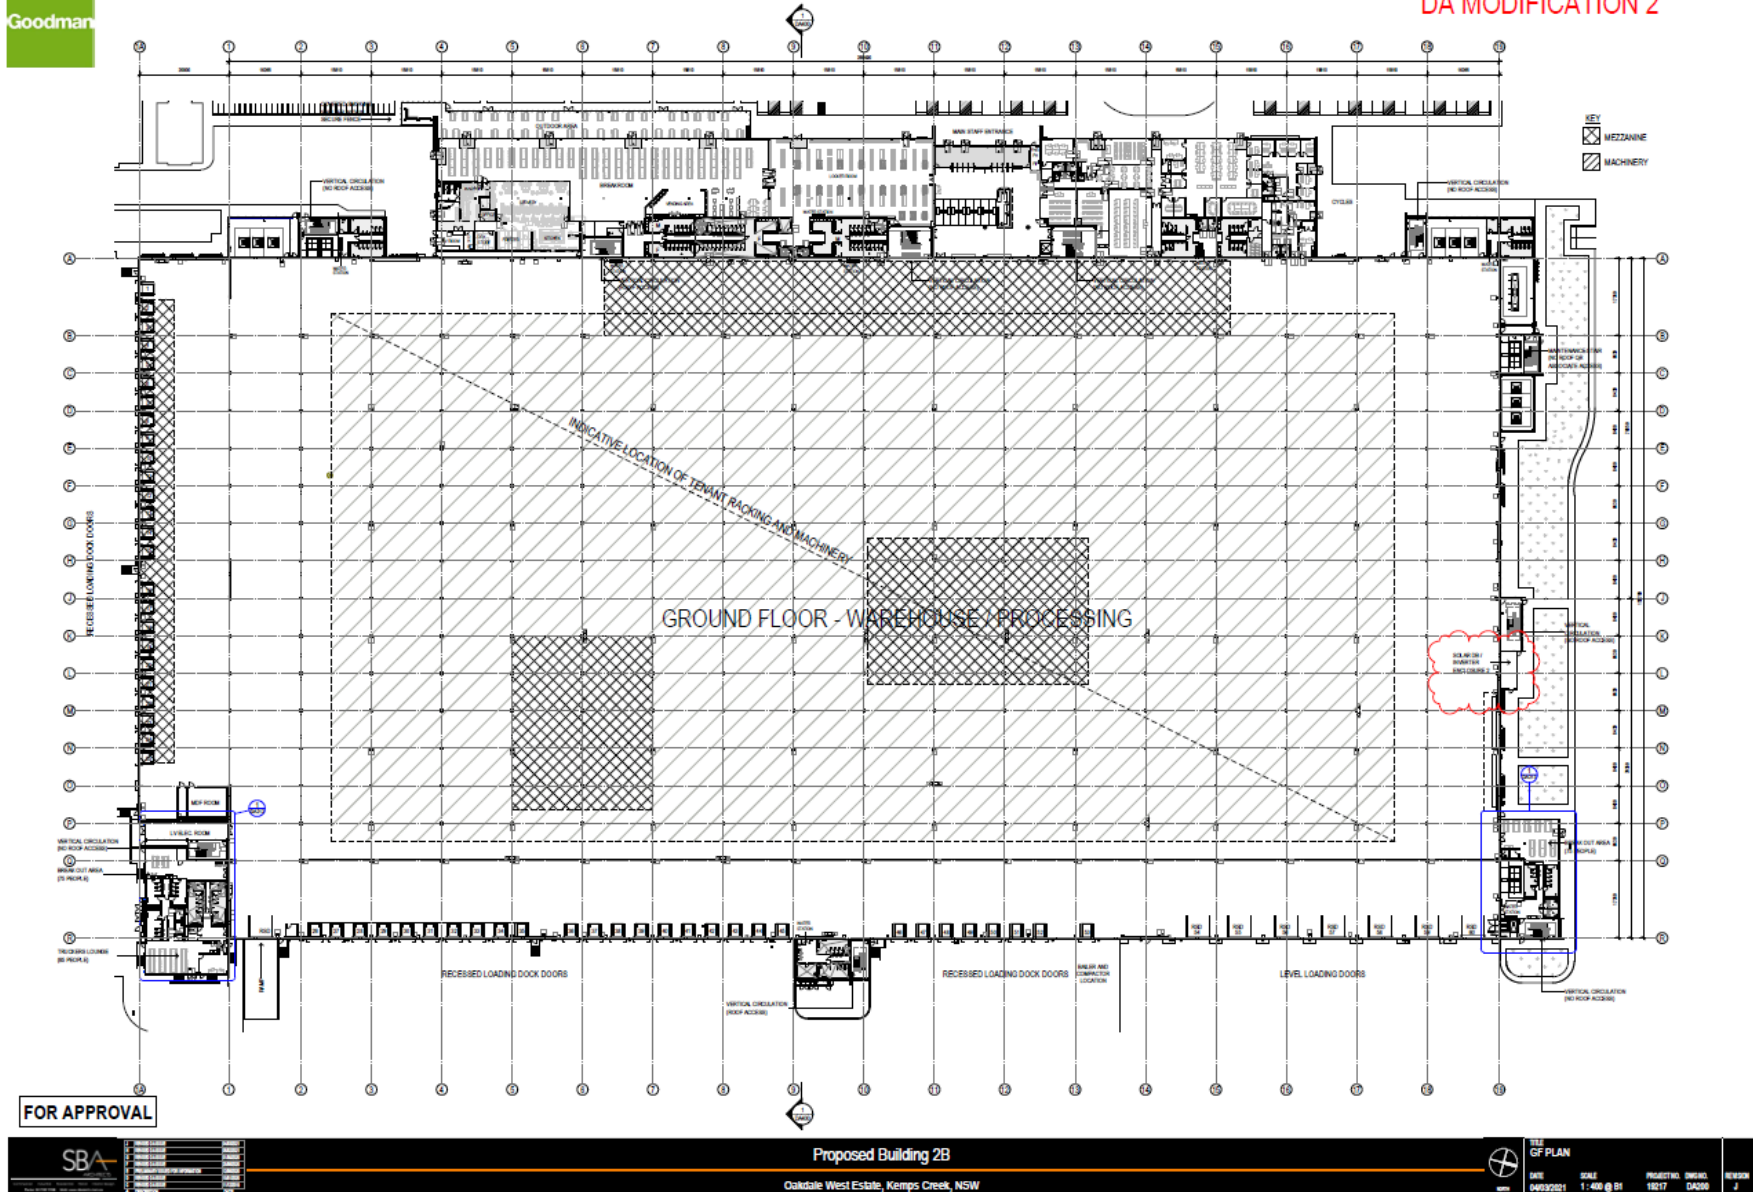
Typical Floor Plan (Mod 2 – Plan 2 of 4)
